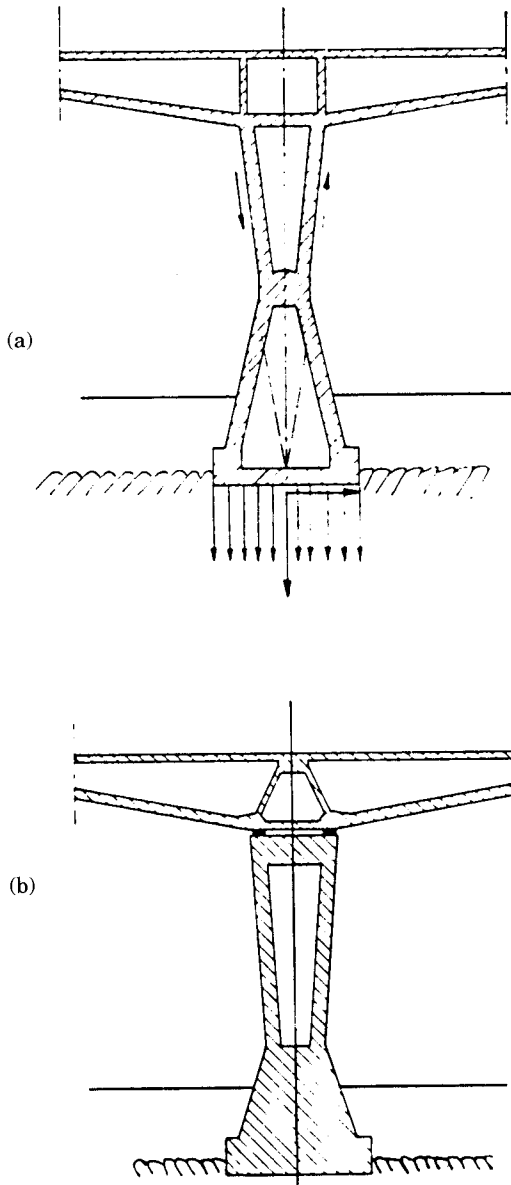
Pier example for segmental concrete bridges (from Podolny and Muller, 1982).
